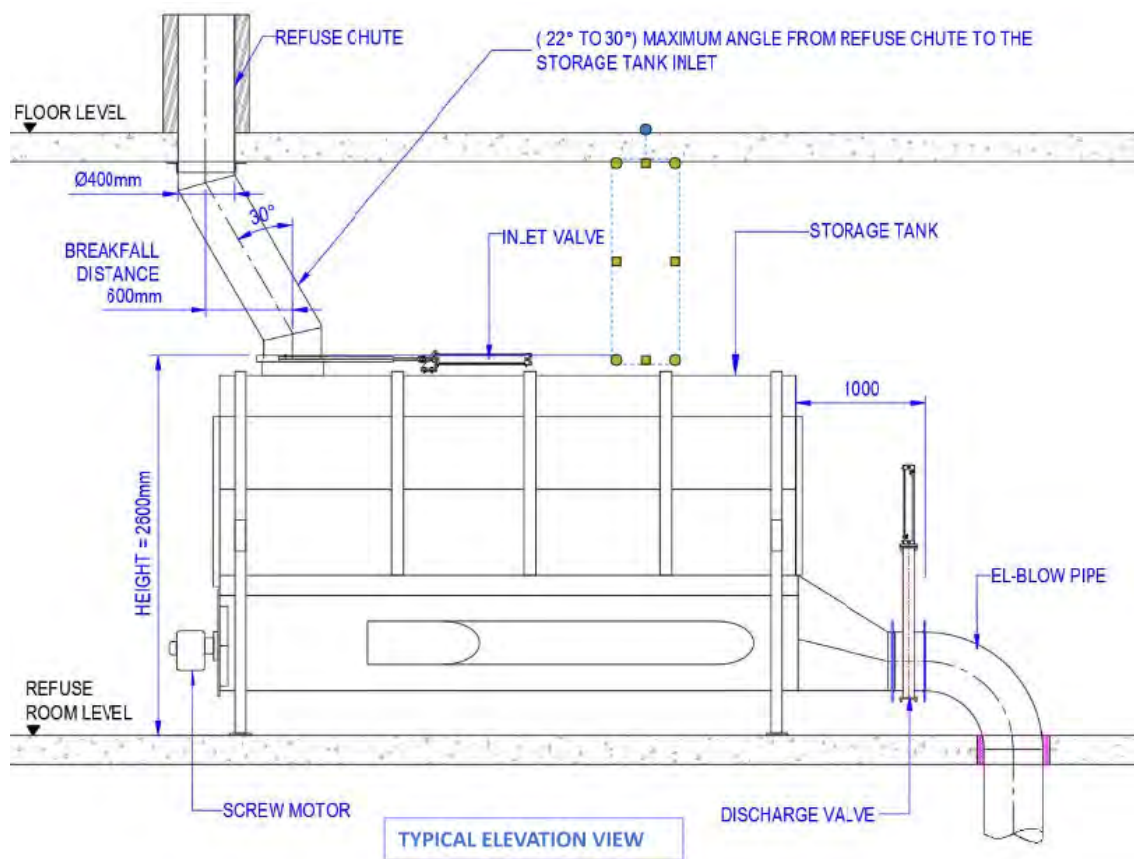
Waste Chute Connection to Storage Tank and Inlet and Discharge Valves with pipework reticulating at high level of floor below storage tanks (Source RVAC)
